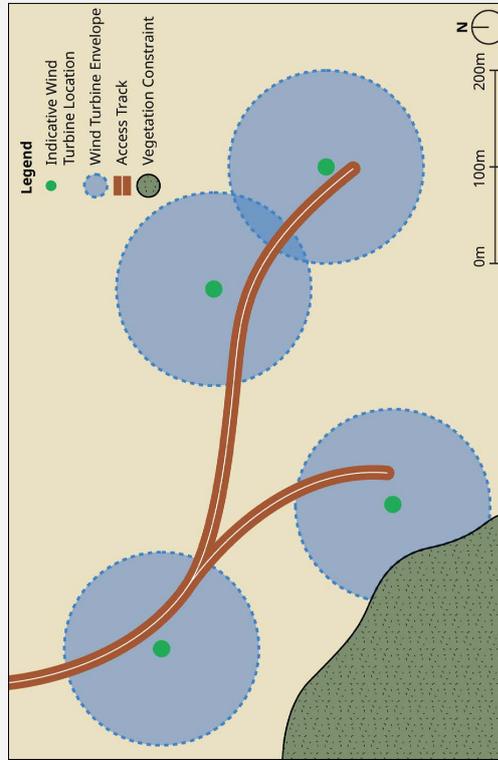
Example site plan showing wind turbine envelopes for micro-siting post-development approval
